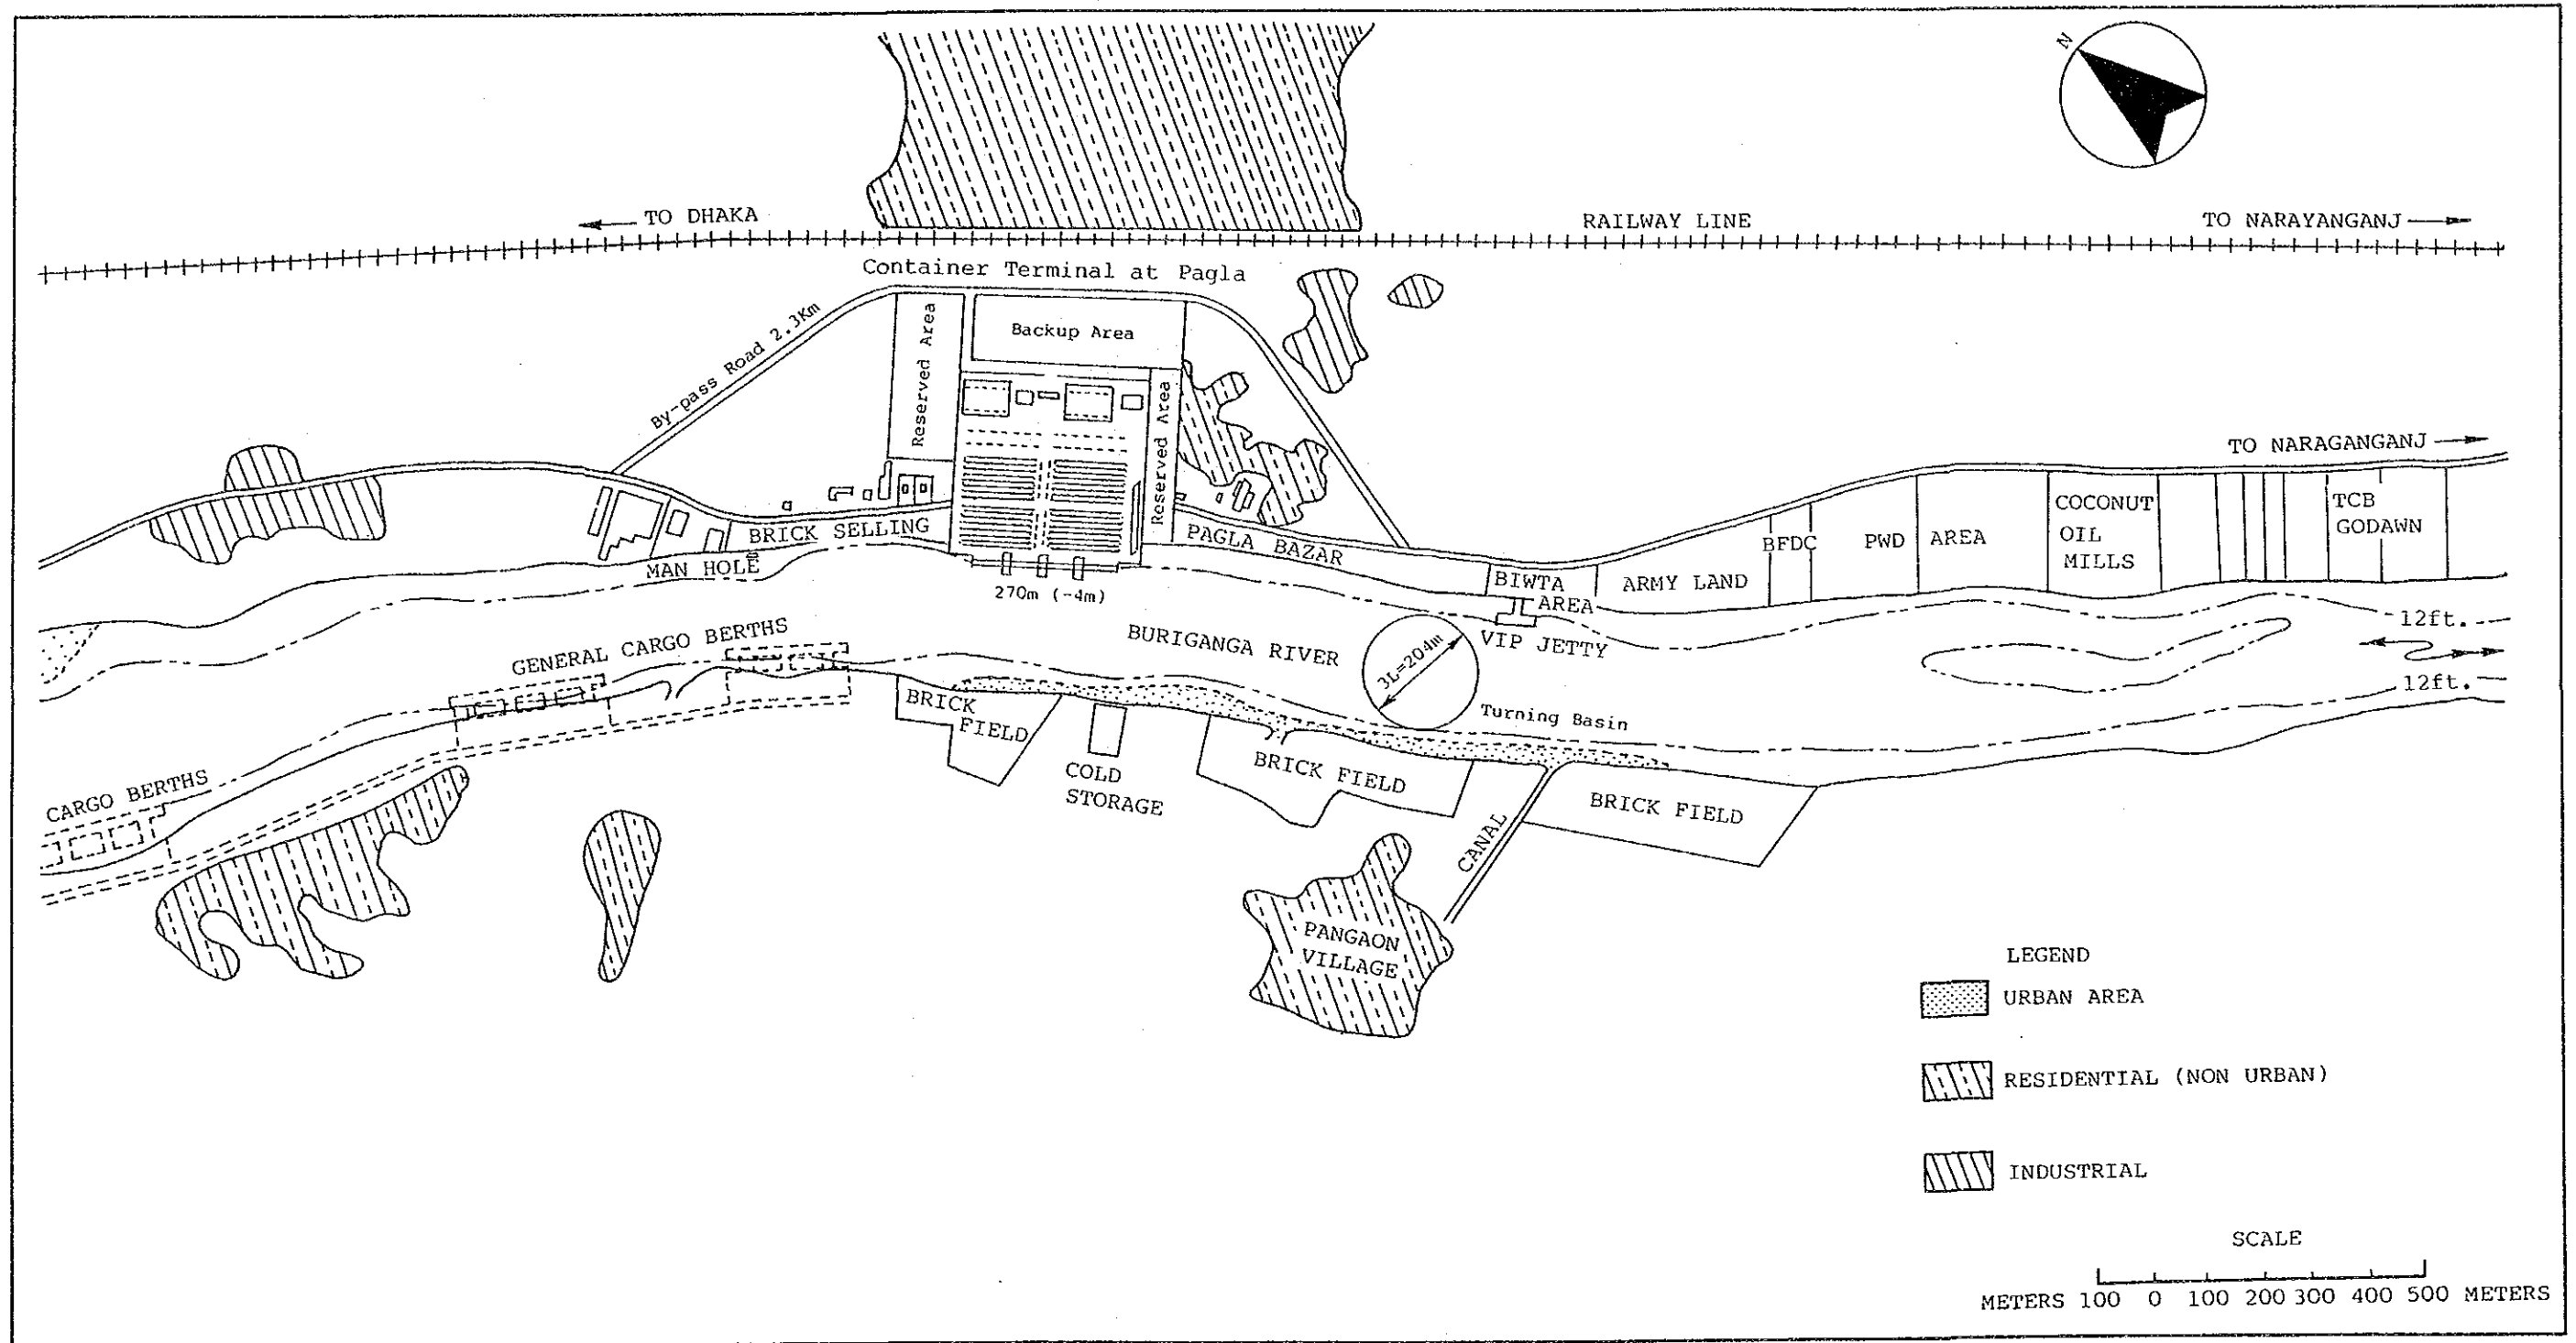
Alternative Development plan at Pagla Site - Case 2
